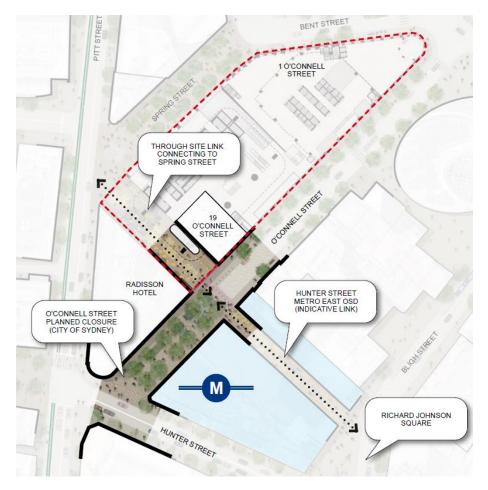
Relationship between the Hunter Street Metro site and proposed through-site link
